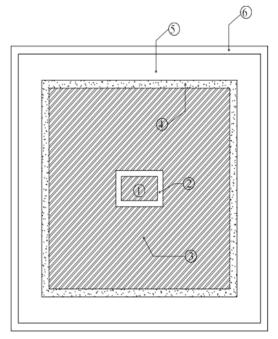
(Dimensional Plan of Foundation showing Strengthening)
